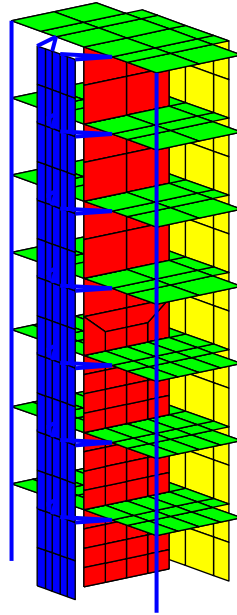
Finite element model of the shear wall building slice in FEDEASLab
